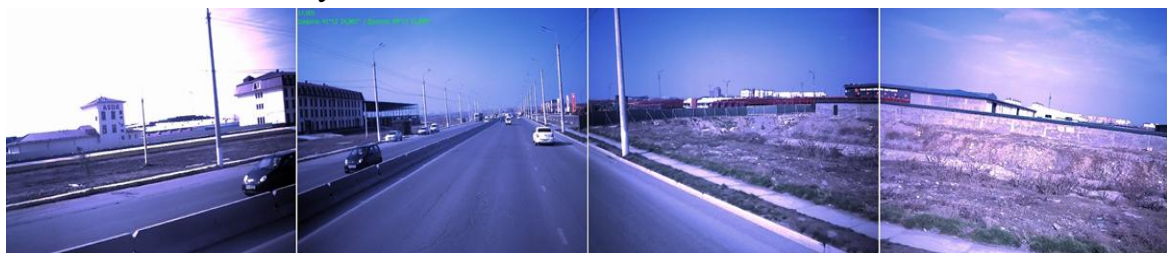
Pictures of the highway 4P21 section – “Tashkent bypass road” obtained with the help of a mobile road laboratory.
